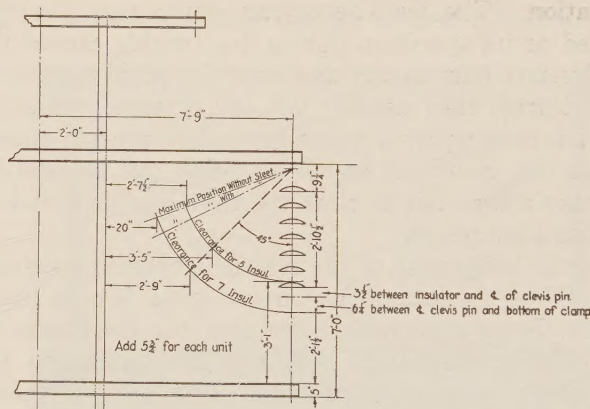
CLEARANCES FOR FIVE- AND SEVEN-INSULATOR UNITS
